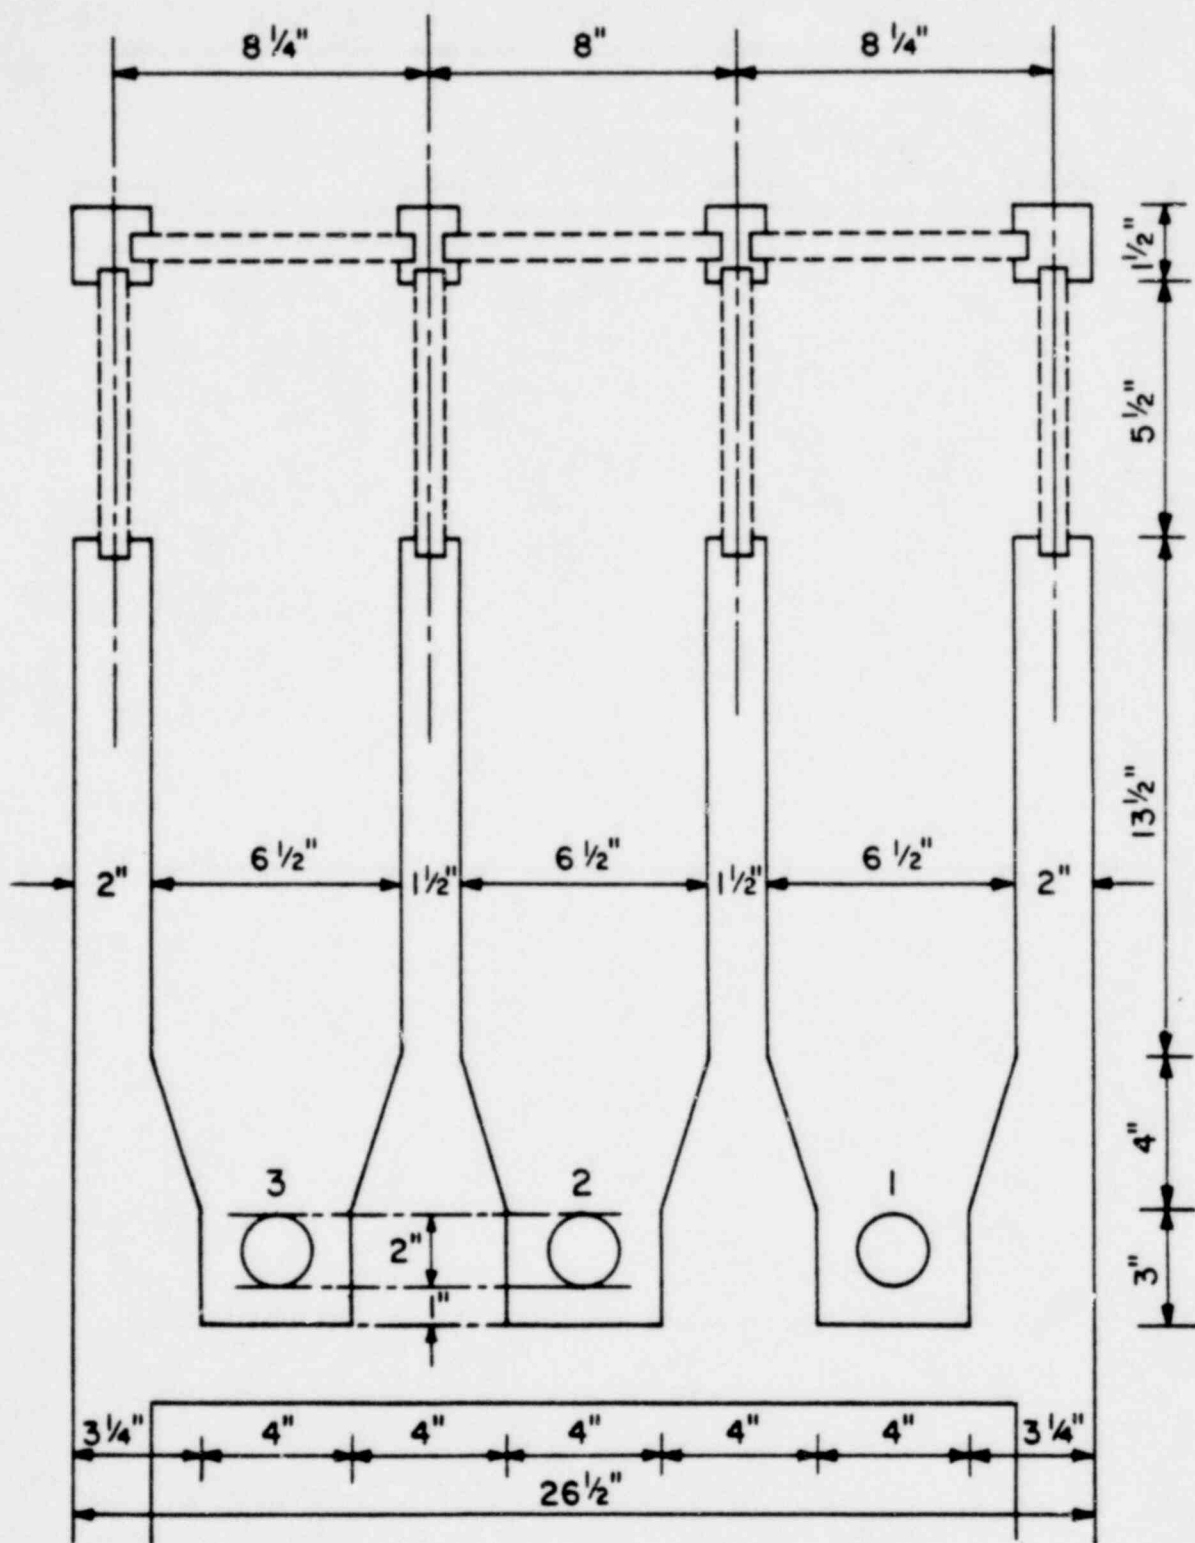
Intake structure no. 2 modeled after SL's drawing no. MS-10. Scale ratio = 1:24
